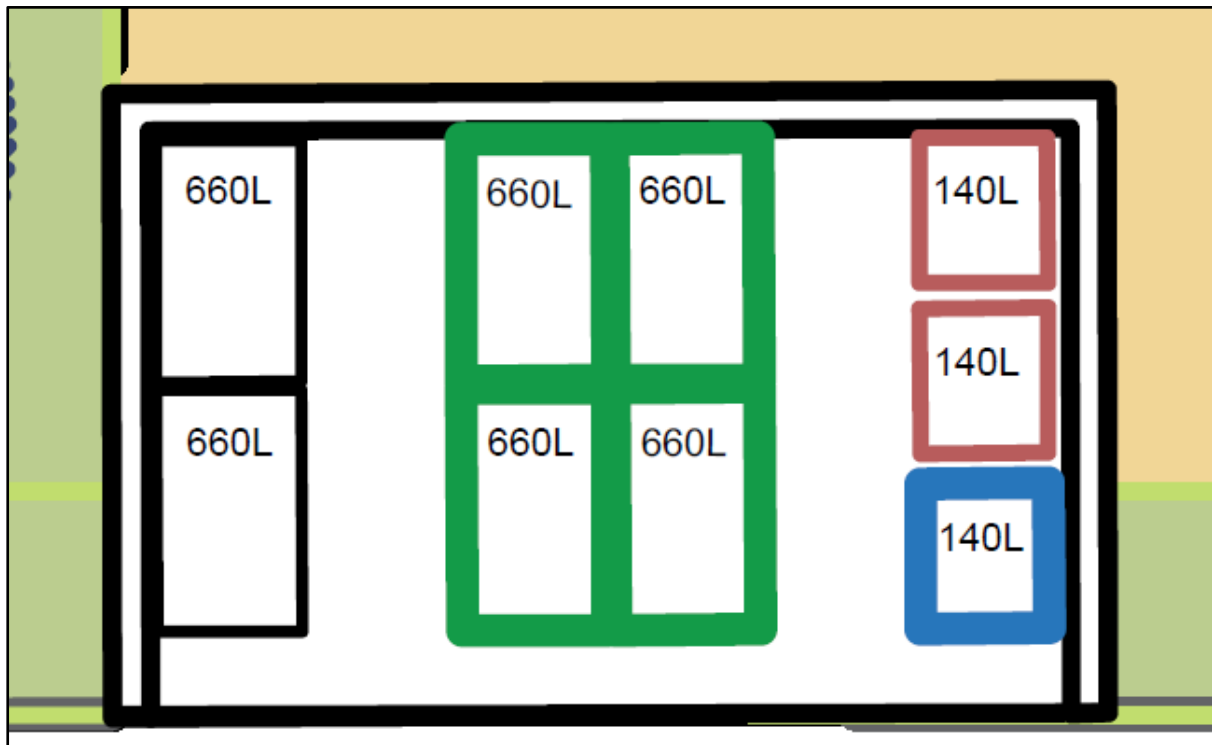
Layout of Creche Waste Storage Area (NDBA Architects, 2025)
